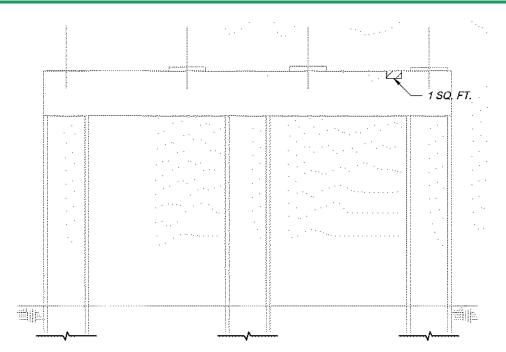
Location of Proposed Concrete Repairs - Pier 2 Upstation (South) Face Elevation MP 182.1
